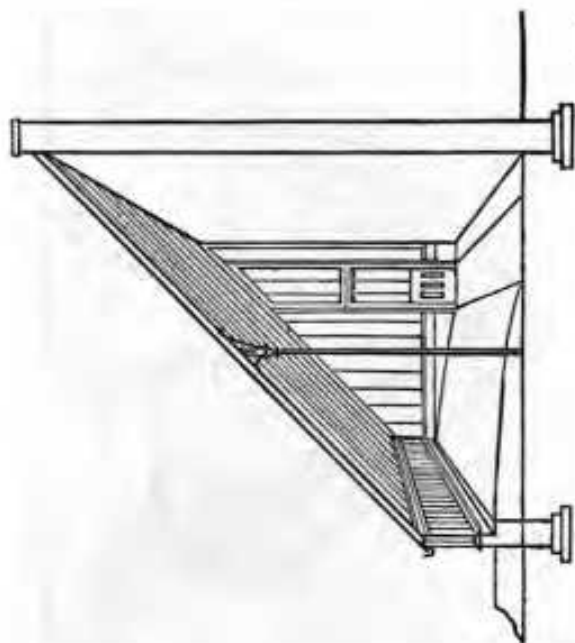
Vinery, 14 feet wide, with square pitched roof, erected against a wall 18 feet high.
